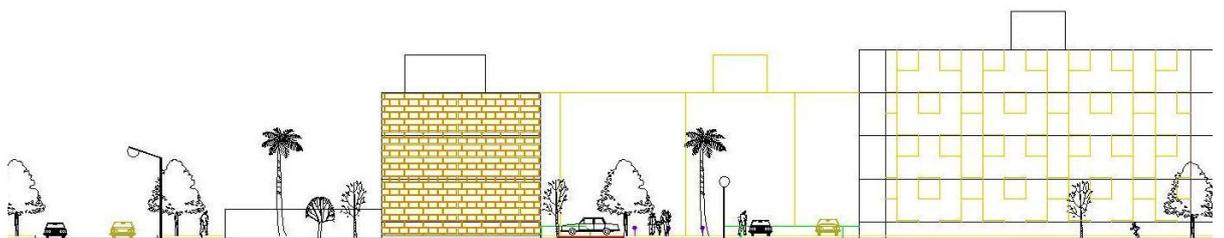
16: Site Cross-section – Proposed Scheme, Ben-Talb area
